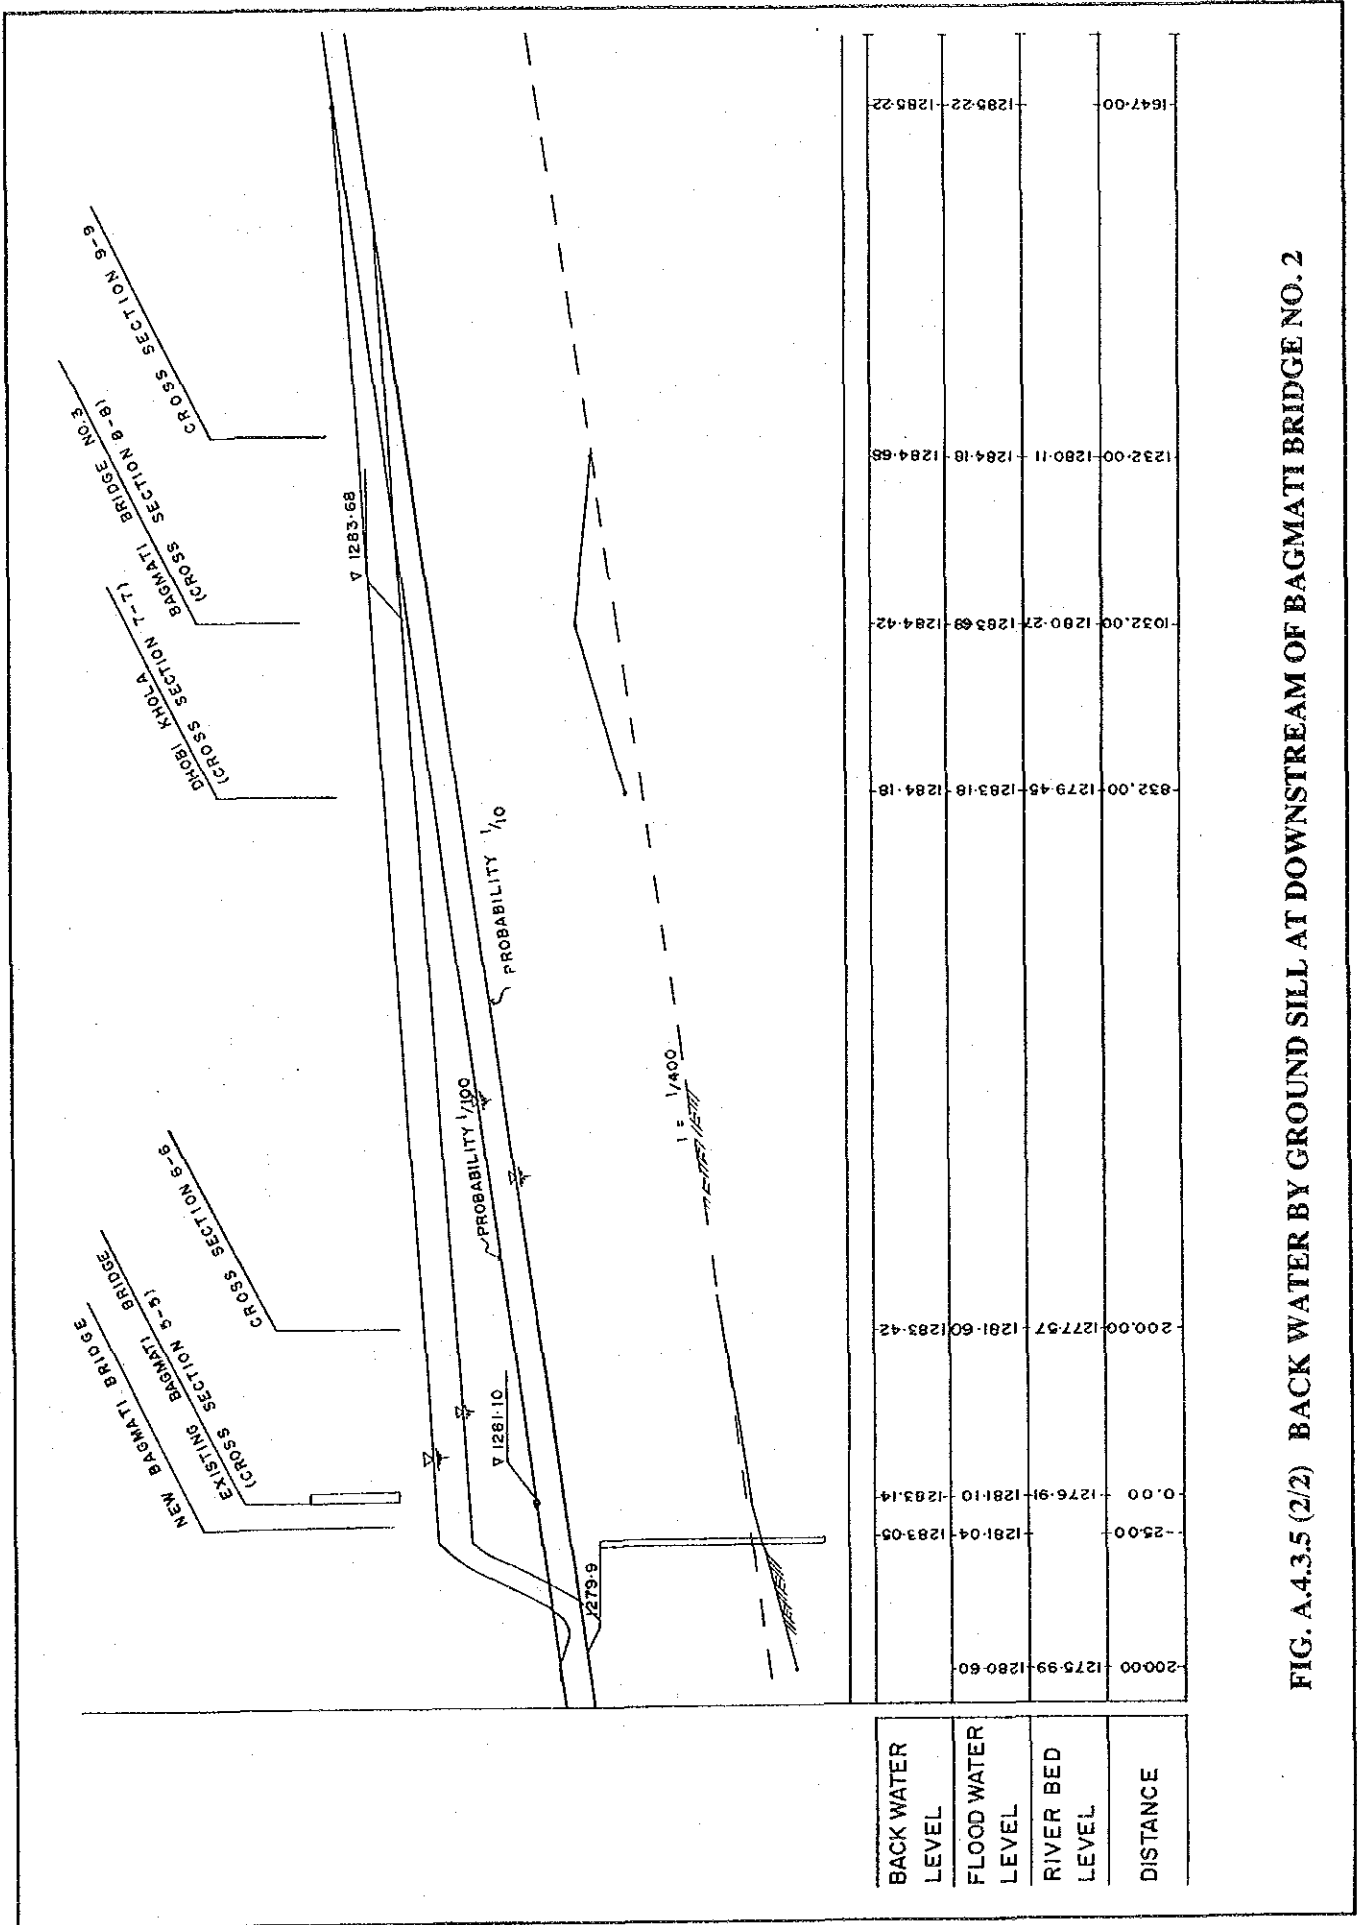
(2/2) BACK WATER BY GROUND SILL AT DOWNSTREAM OF BAGMATI BRIDGE NO. 2
